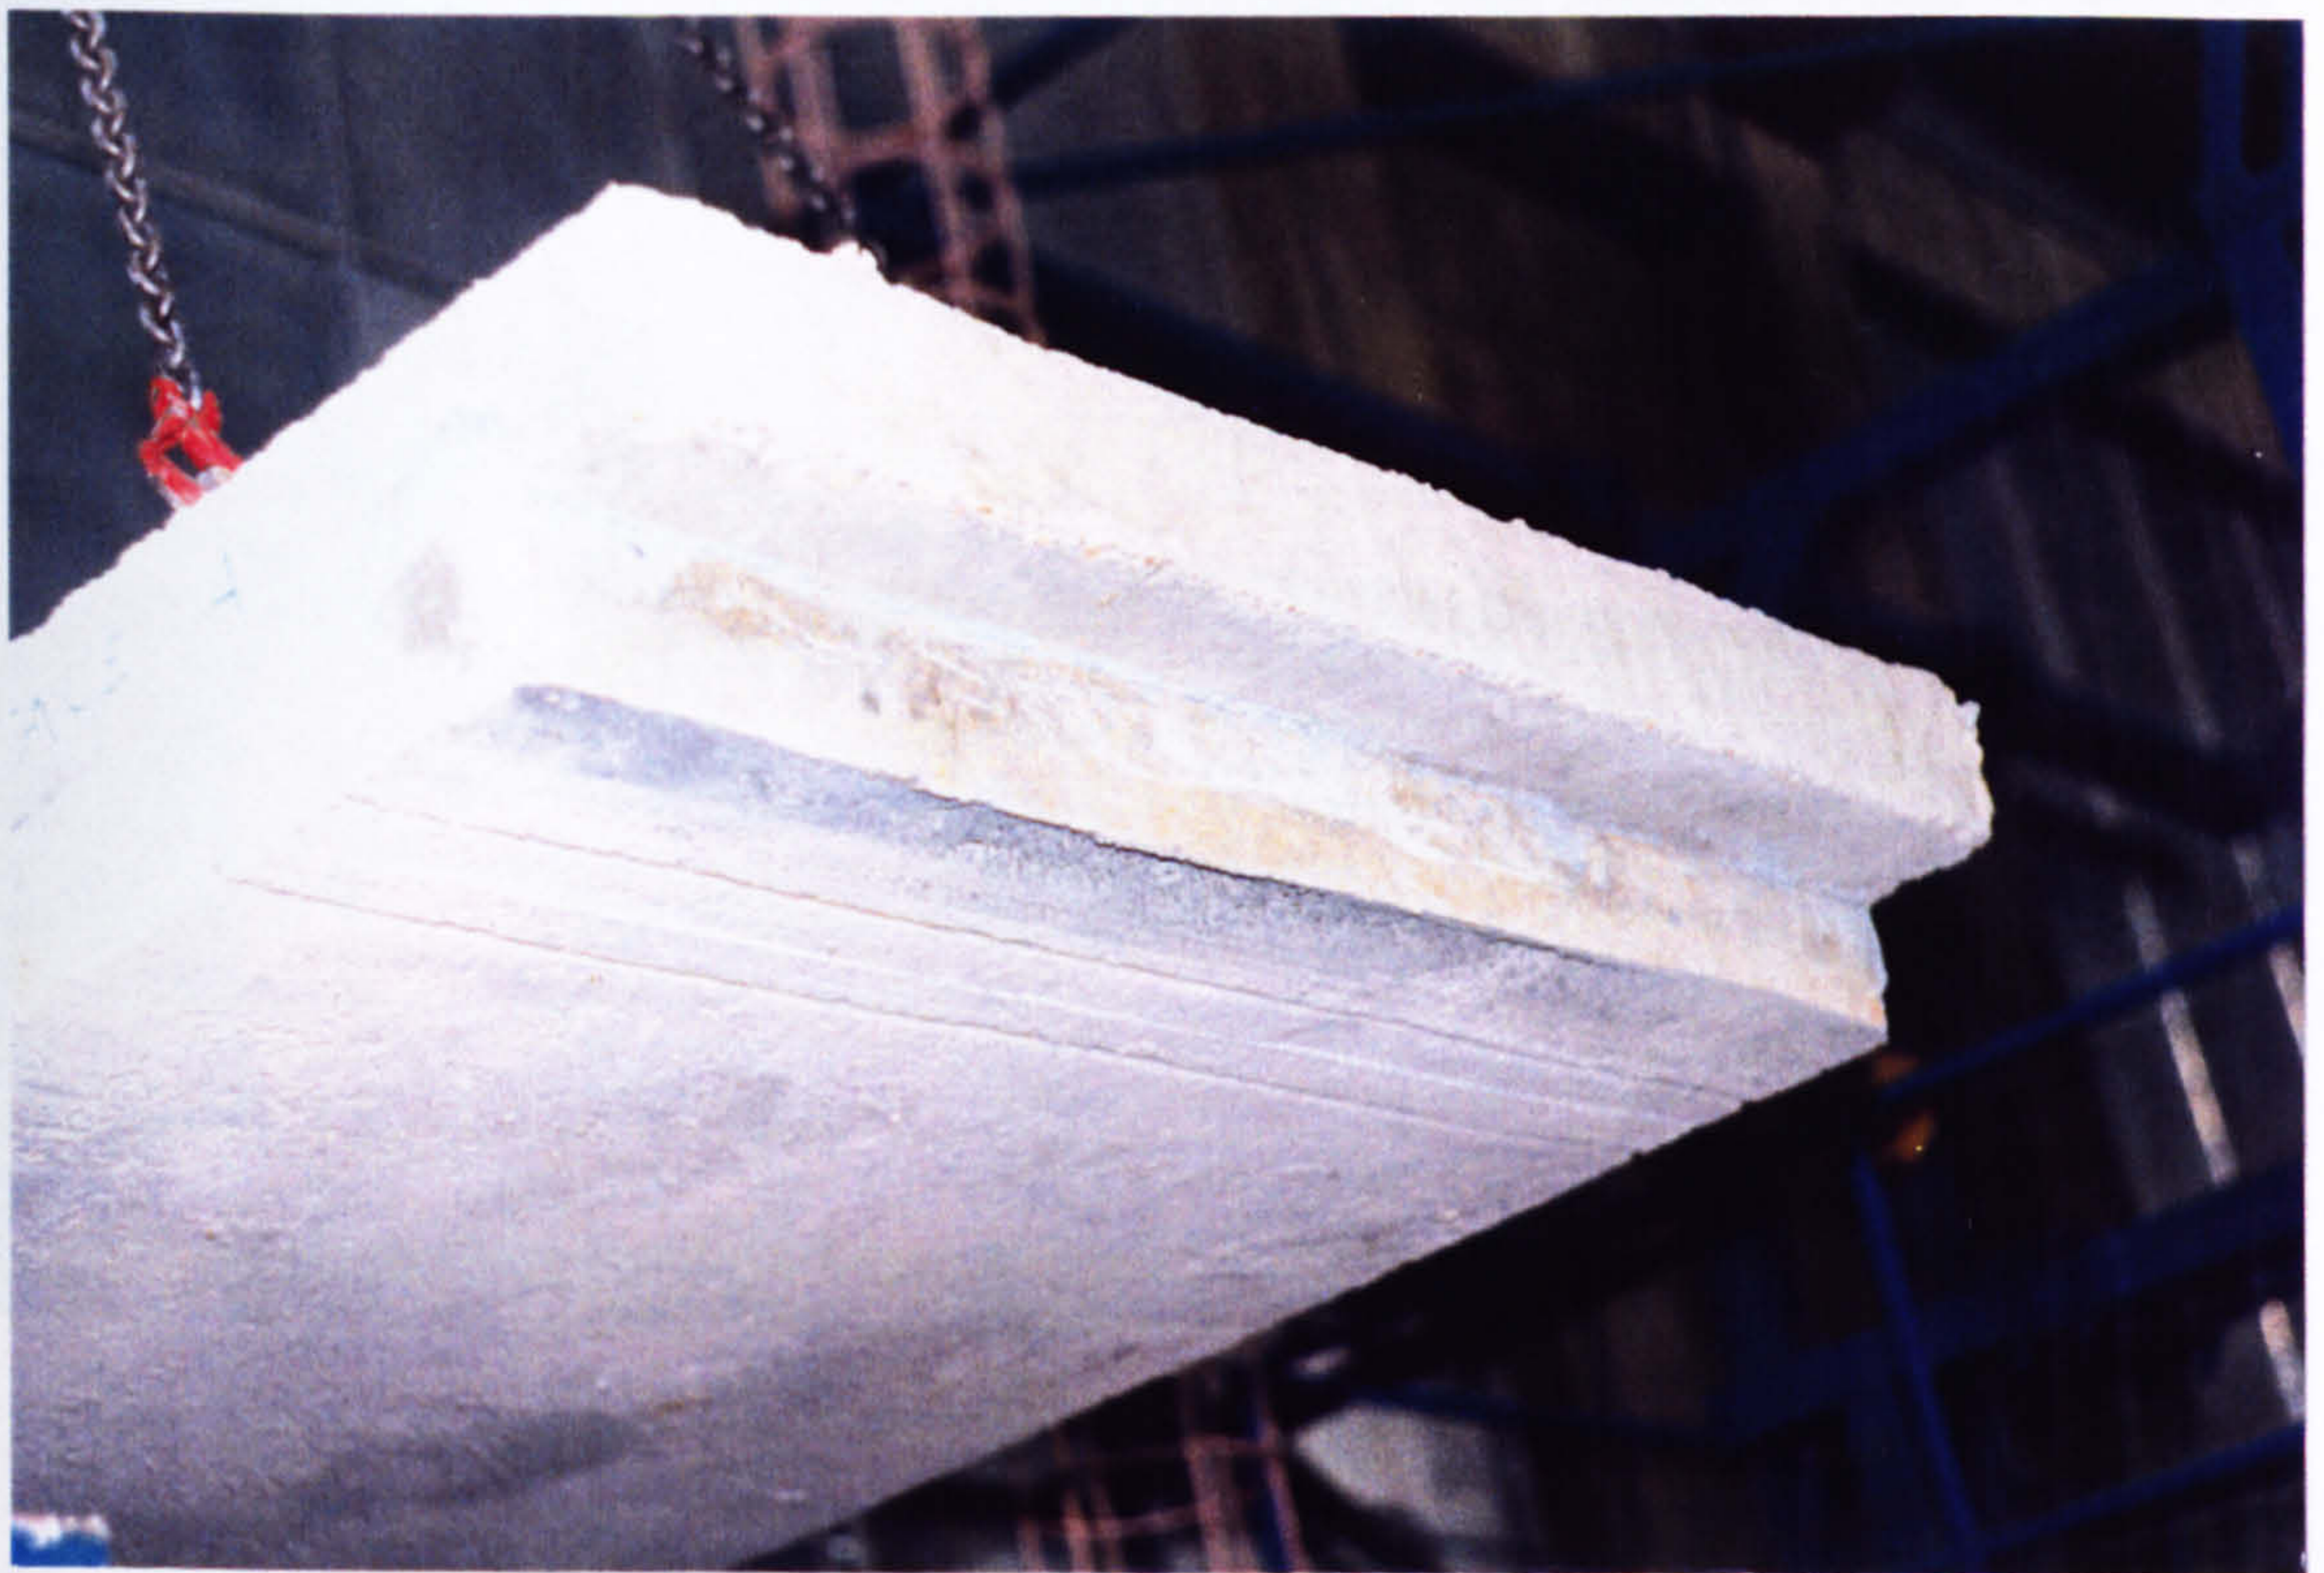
Reinforced sprayed concrete curtailment - underside view.
